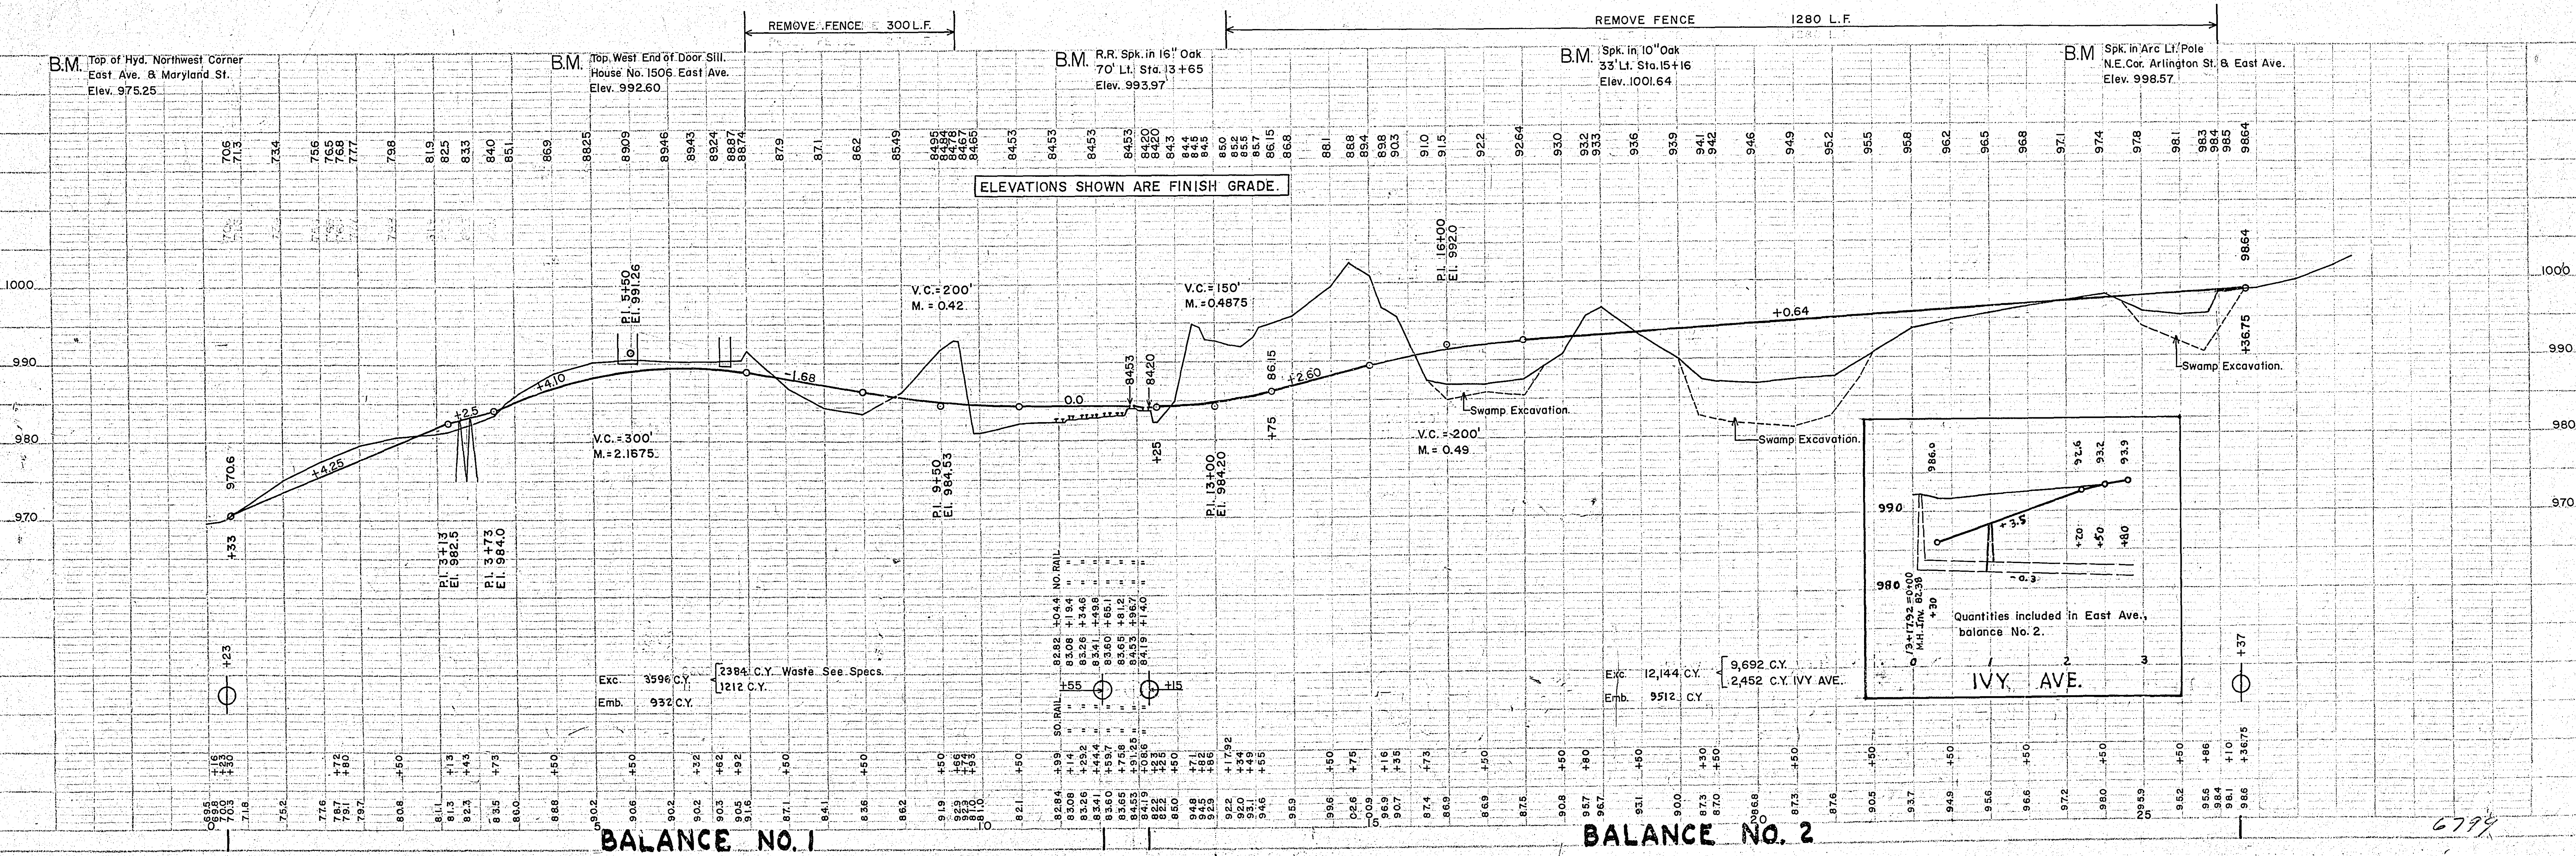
PLAN PROFILE & BALANCE SHEET
